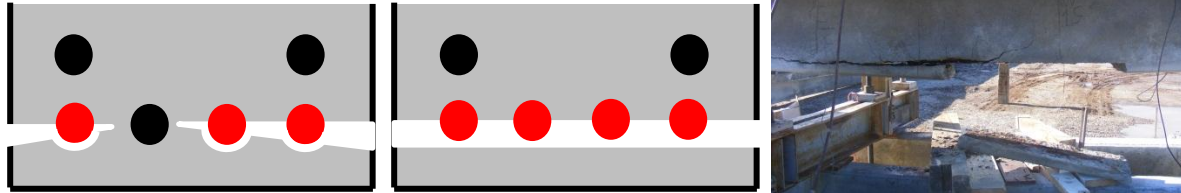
Diagram of crack and debonding progression, and evidence of soffit delamination
